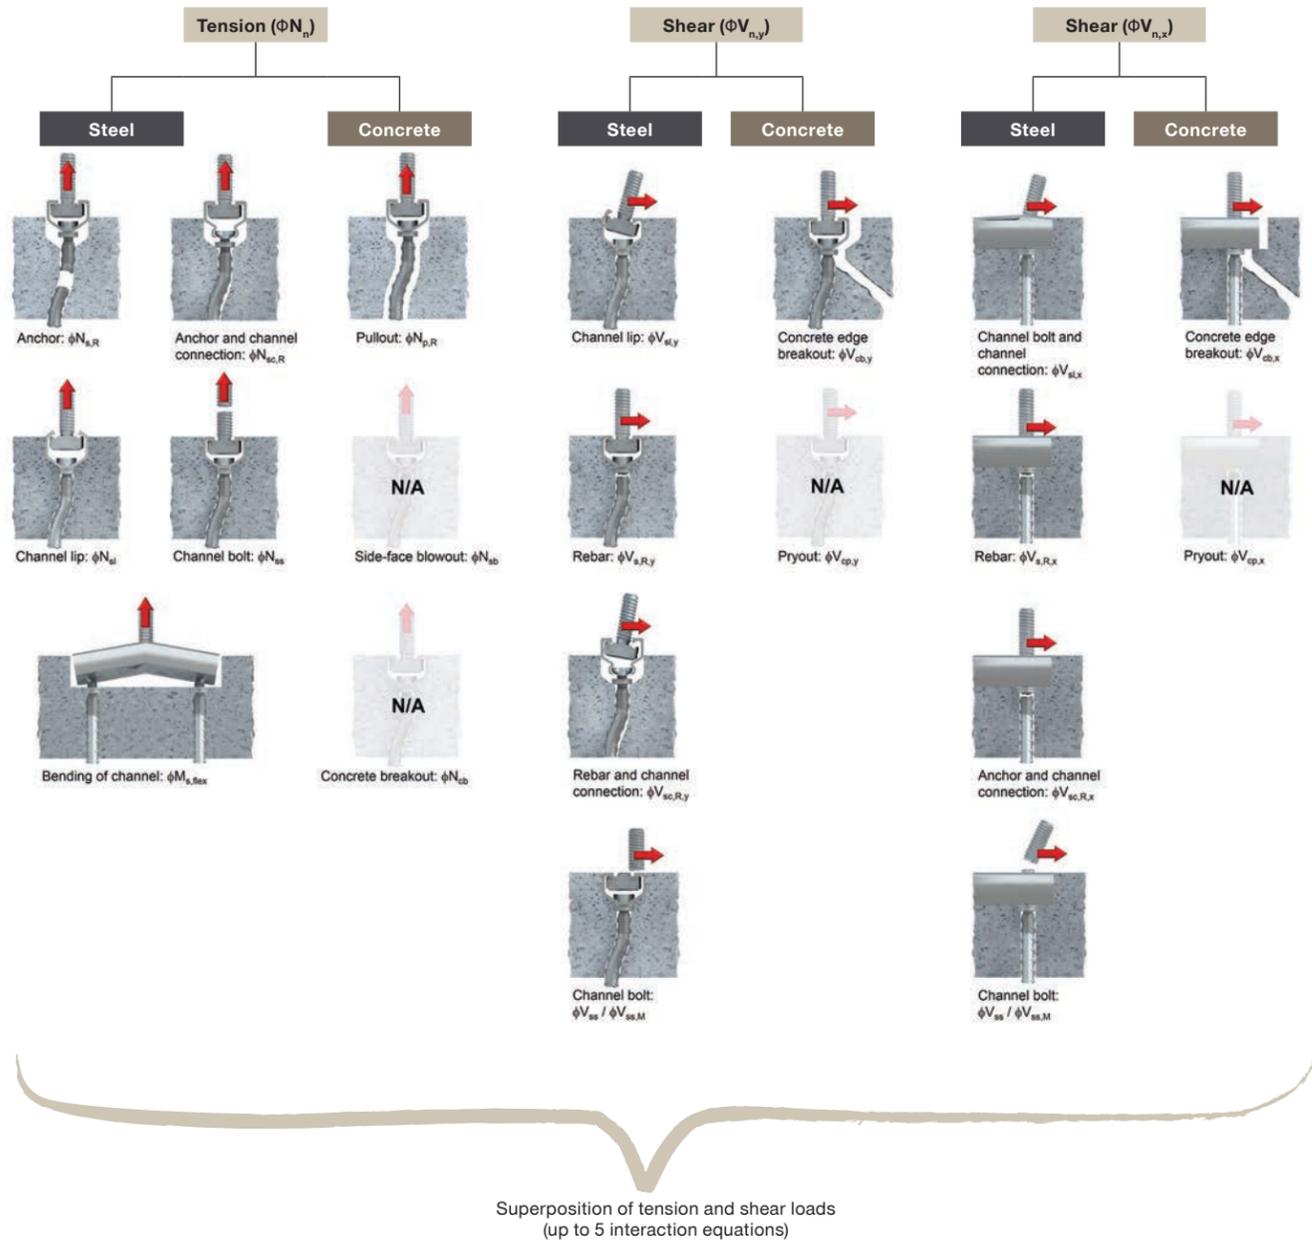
Concrete failure mode of Cast-in anchor channel with rebar anchors (HAC CRFoS U) — Section View.
